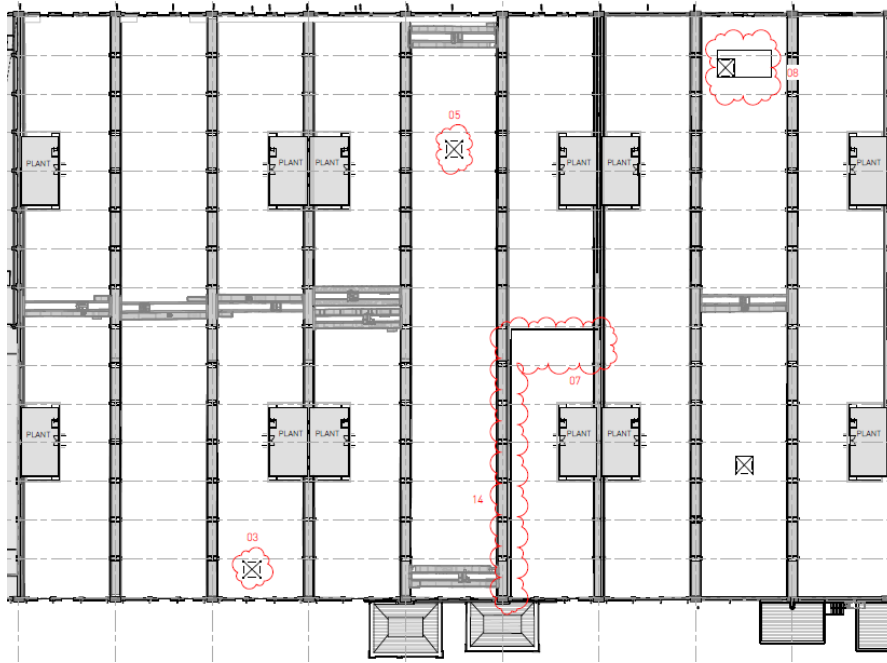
Approved Second Floor Plan (Source: Sissons, 2019)
